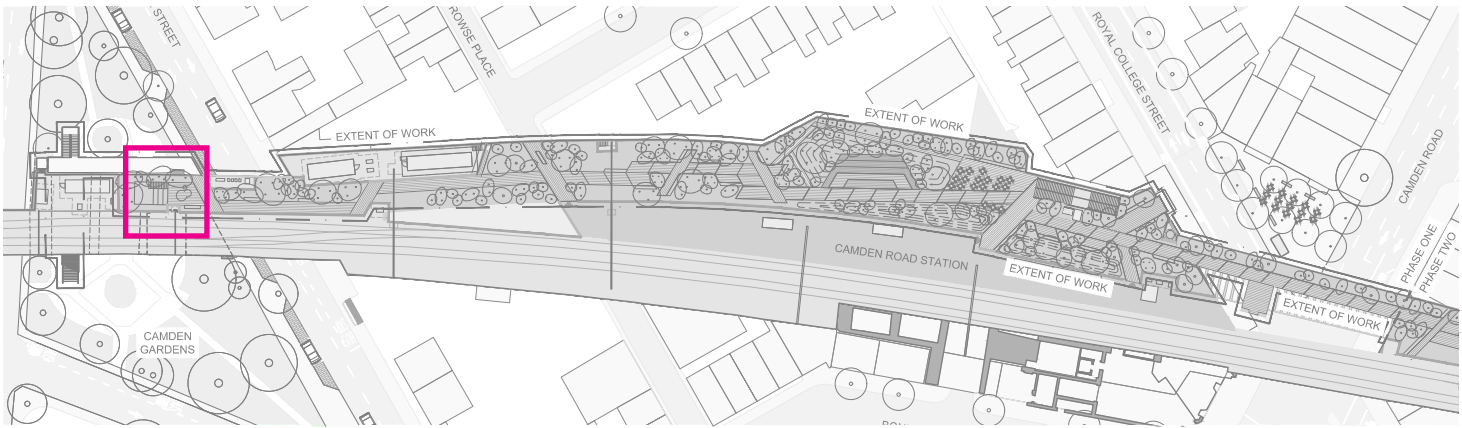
CAMDEN GARDENS WASTE BIN LOCATION PLAN
